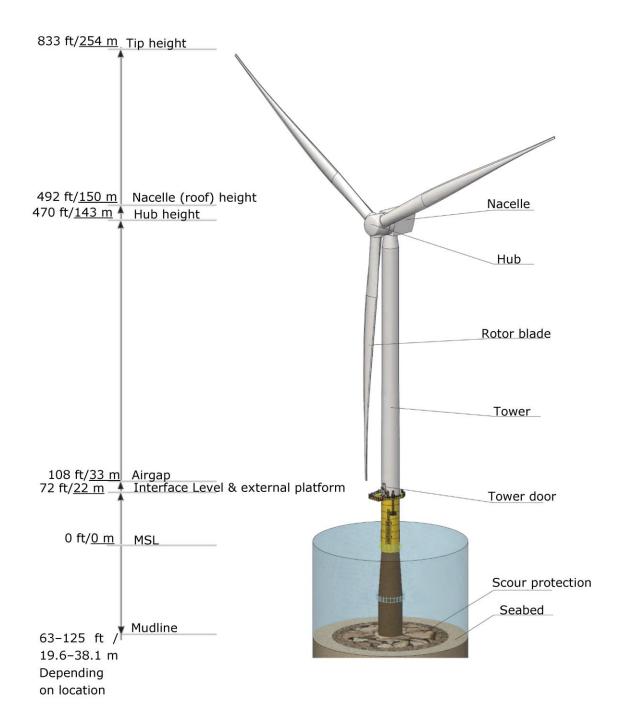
Simplified Elevation Drawing of the WTG (Figure provided courtesy of Ramboll)
